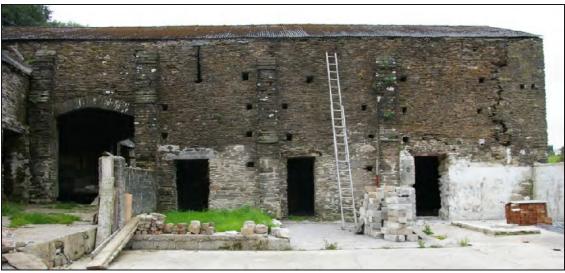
East Elevation of the Great Barn, viewed from the east (scale 2m).
